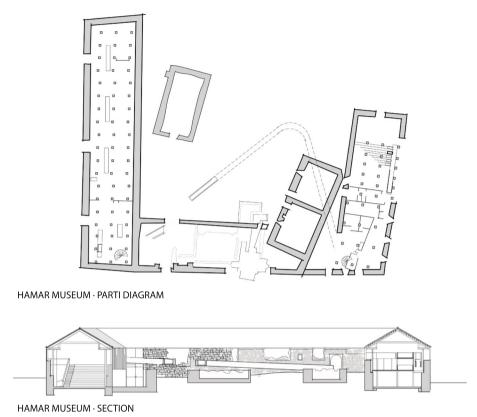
Hedmark Museum, Hamar, Norway, 1967–2005. Above: Plan. Below: building section (Source: the authors)
